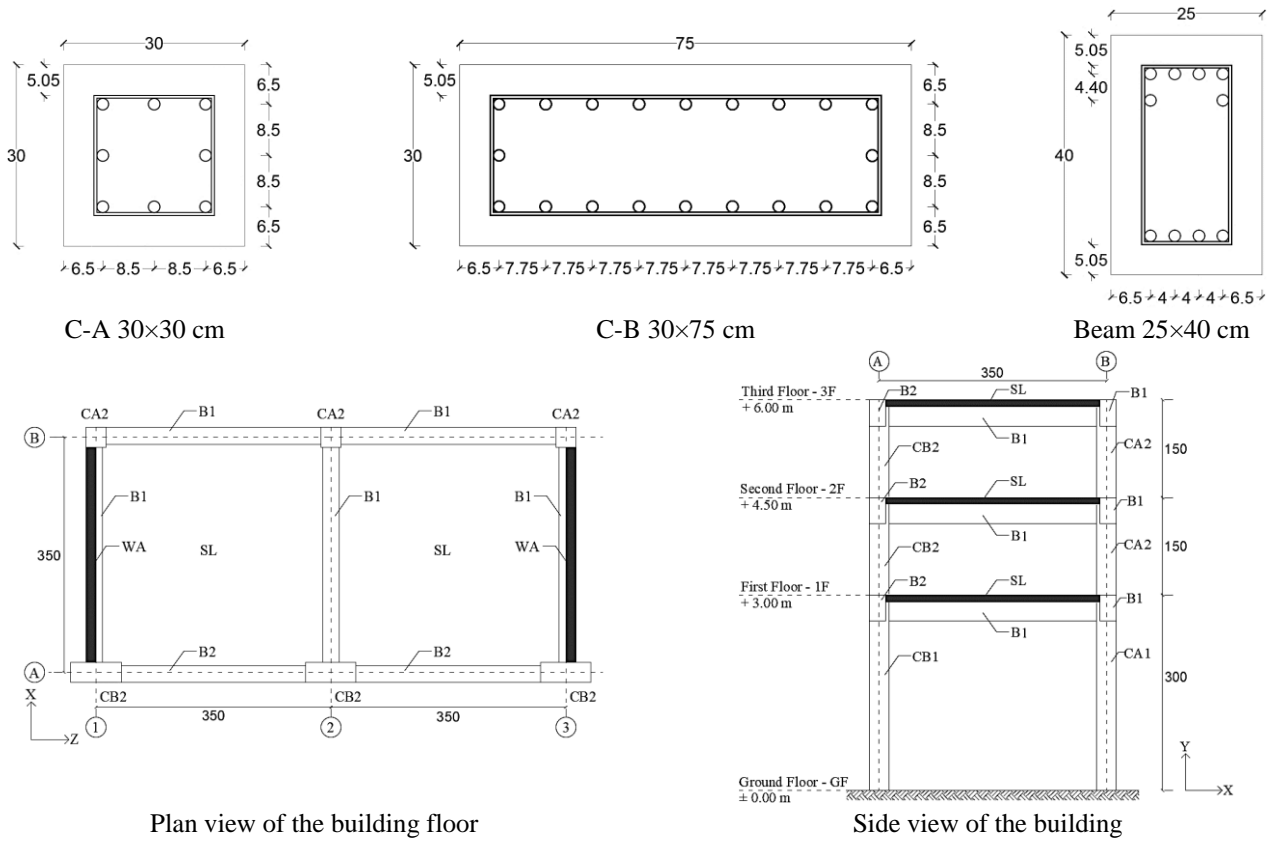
The cross-sectional details of the RC specimen models (size in cm)
